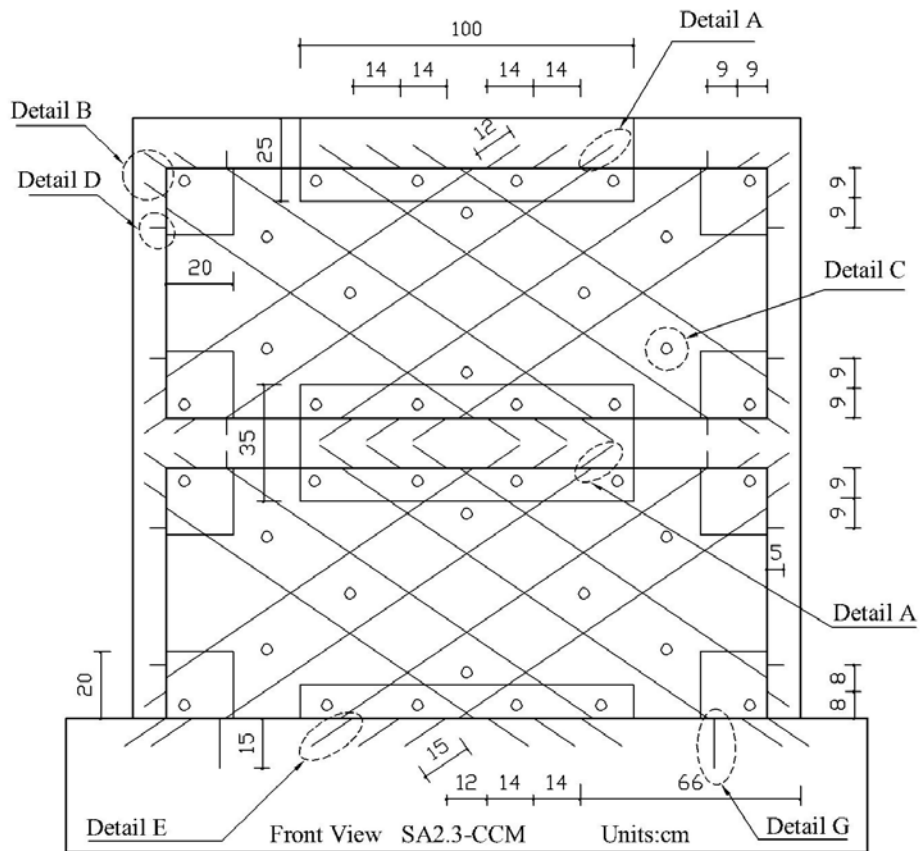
Front view of strengthening details of specimen SA2.3-CCM
